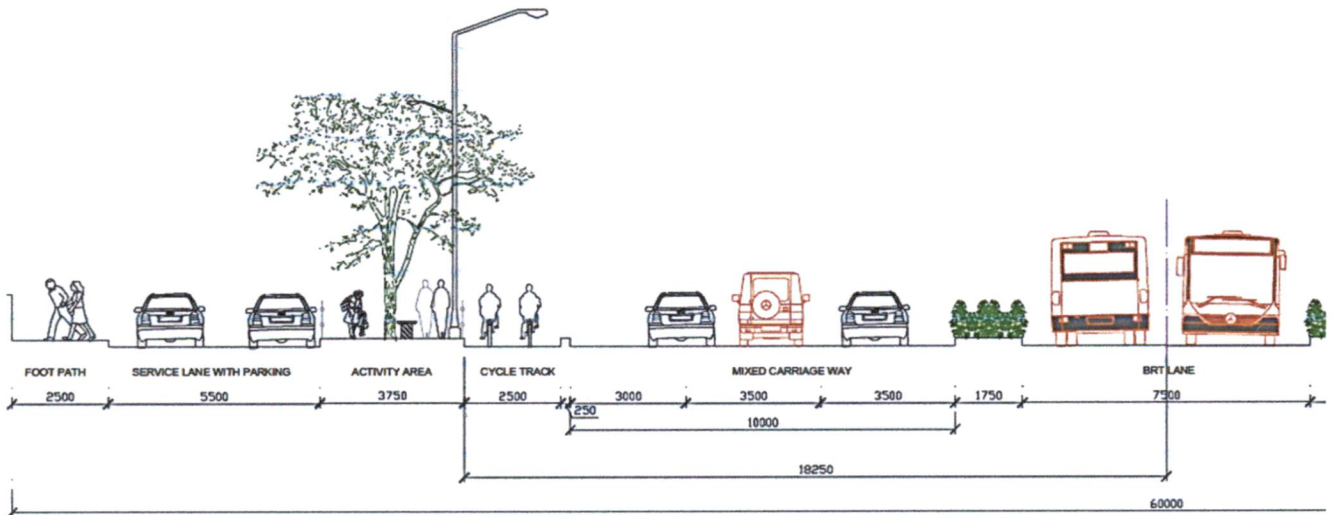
TYPICAL CROSS SECTION OF 60 M ROW BRT CORRIDOR ROAD
